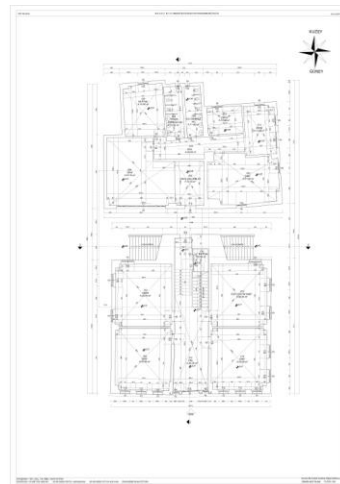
Cezayirli Gazi Hasan Paşa Primary School Plan Survey Work
